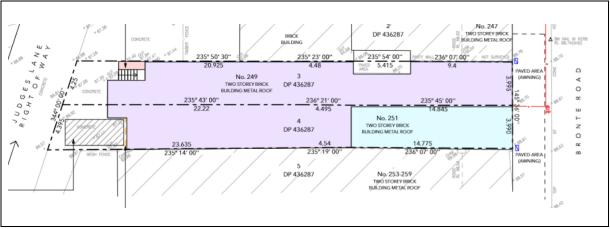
The survey showing the ground floor plan. This application proposes only works to the purple coloured tenancy, being known as 249 Bronte Road, including the whole top floor over both tenancies.
